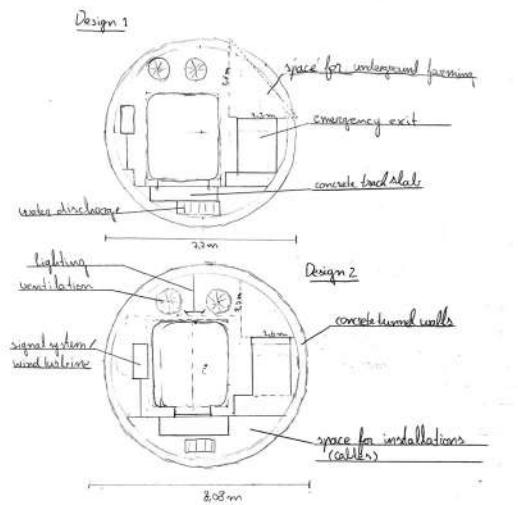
Sketch of Metro tunnel with proposed underground farming (Hydraulics and sustainability discipline)
